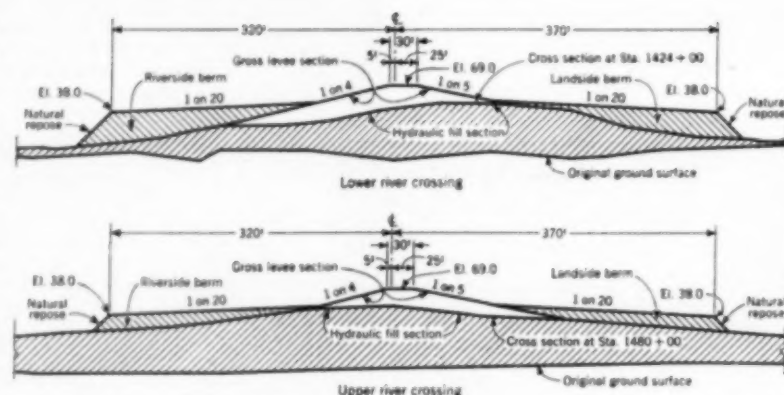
Typical cross-sections of upper and lower river crossings show completed hydraulic fills, and levee and berm sections constructed on them.
